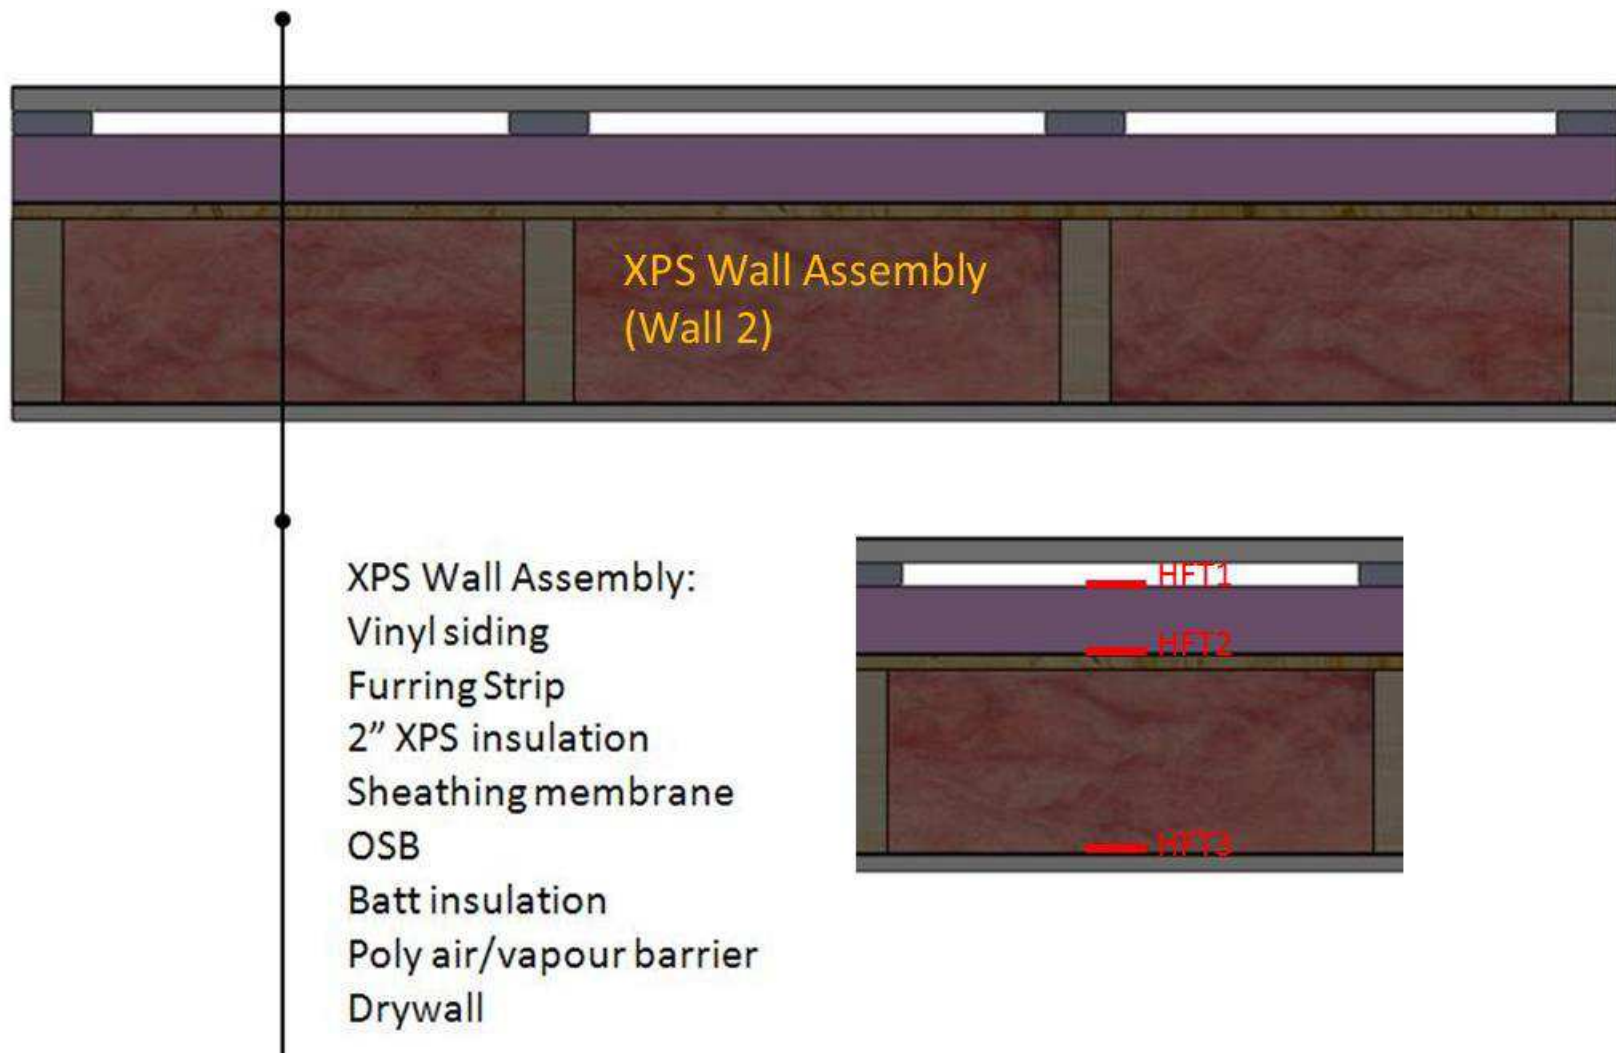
Horizontal cross-section through XPS wall assembly showing locations of Heat Flux Transducers, HFTs (Wall 2)
